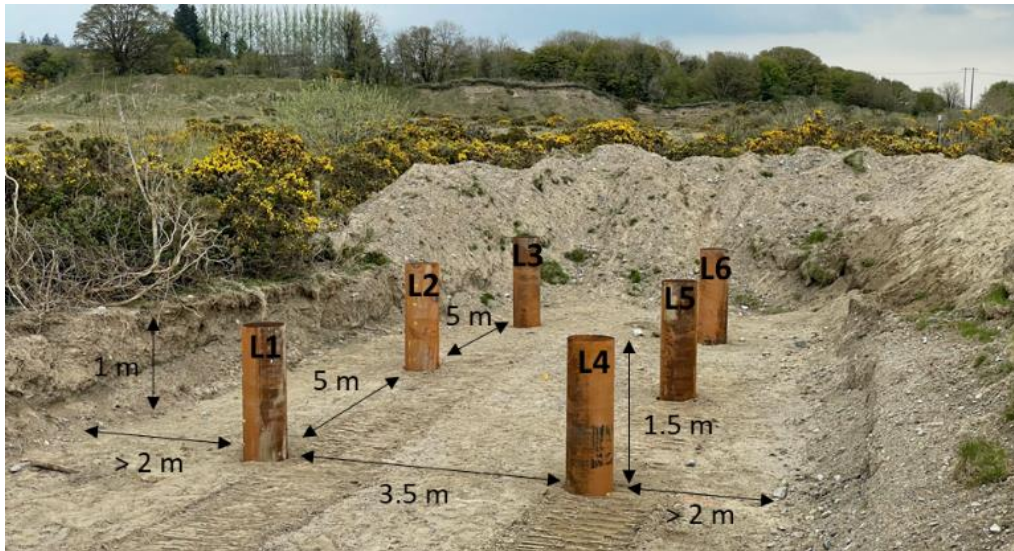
Overview of piles arrangement in lateral pile test pit.
